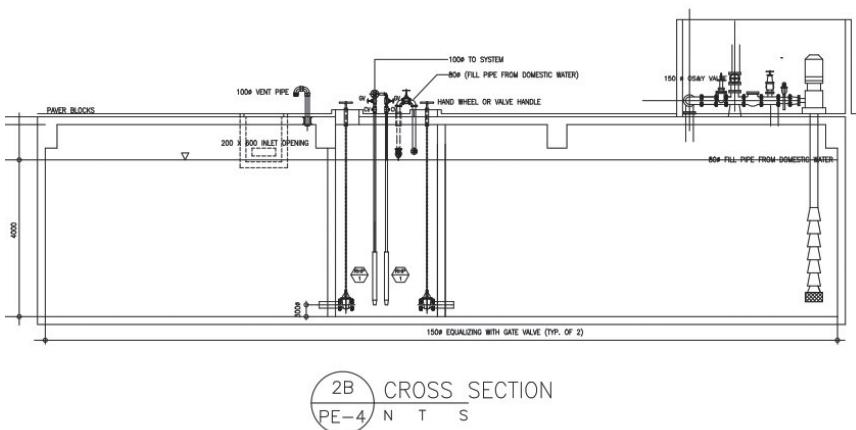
Cross section of a rainwater harvesting collecting tank
